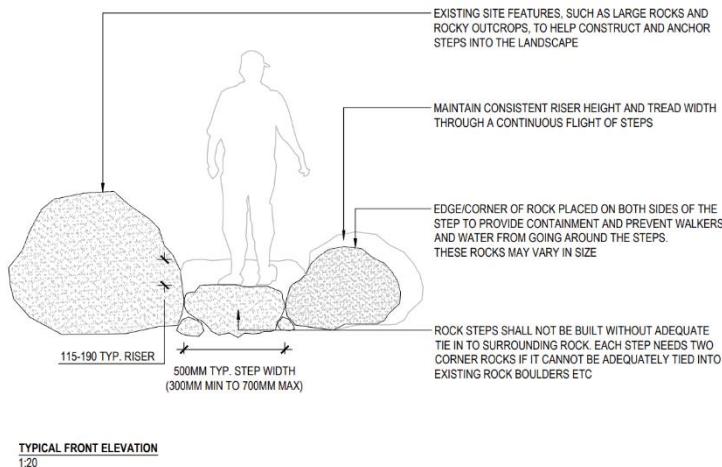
Typical design for stepping stones. (Source: Hansen for Parks Victoria, Kit of Parts: Track and Trail Elevated Walkway – Option 1, Drawing No. L.81.2002 T3, 05/08/2025)
